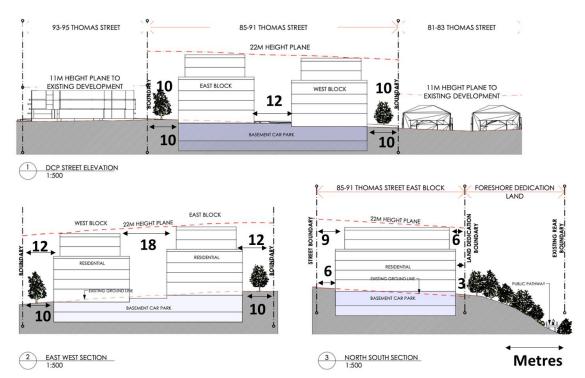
Elevation view of setback and separation controls in Area 5, Morton Street DCP
